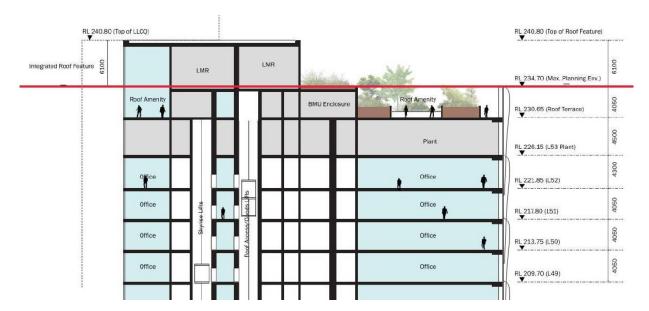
Section through roof showing RL234.70 (232 metres) height plane and extent of height variation
